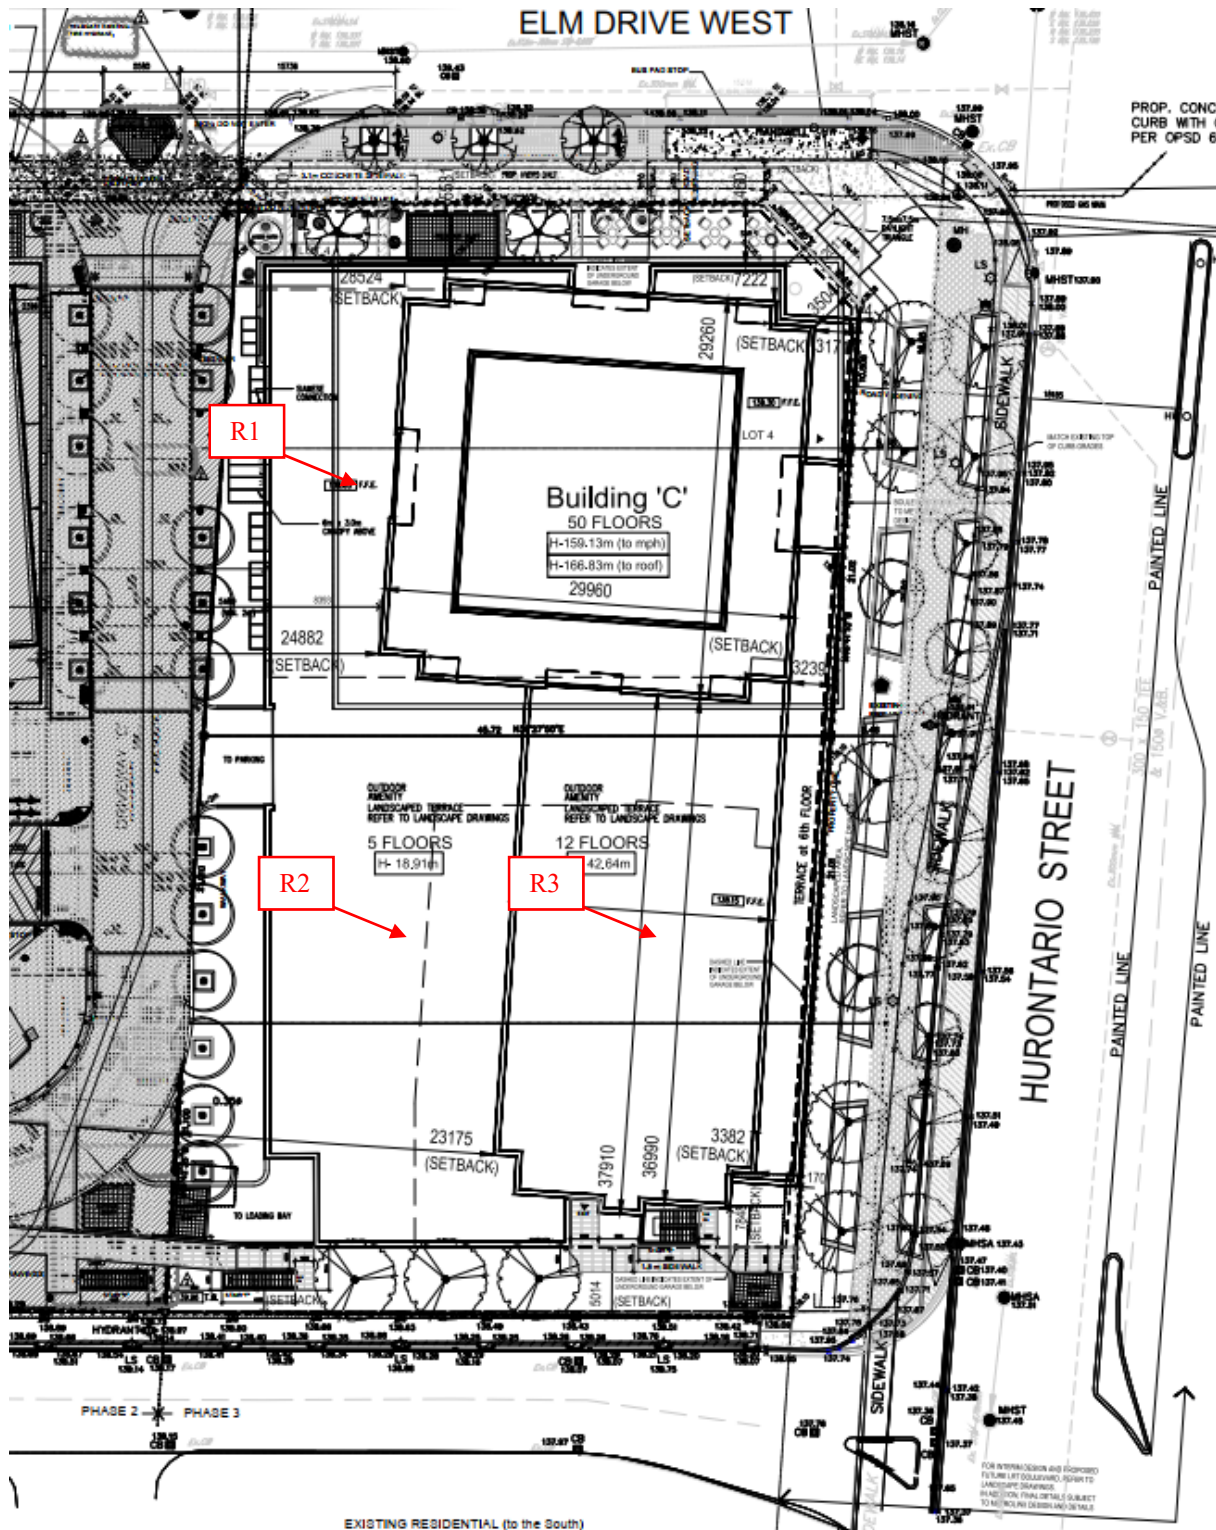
Tower III Site Plan and Receptor Locations in Outdoor Living Areas
